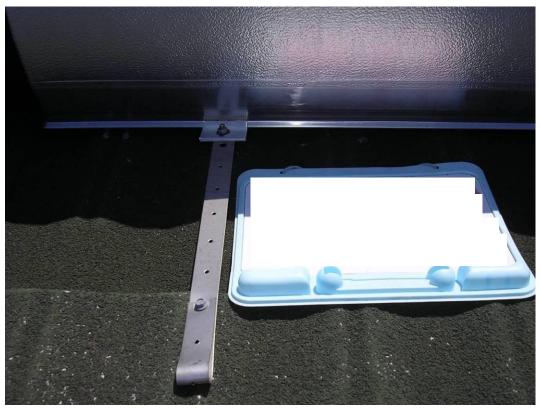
Stainless steel strap, galvanised screws, zinc and chip-coated roof, no separator.
